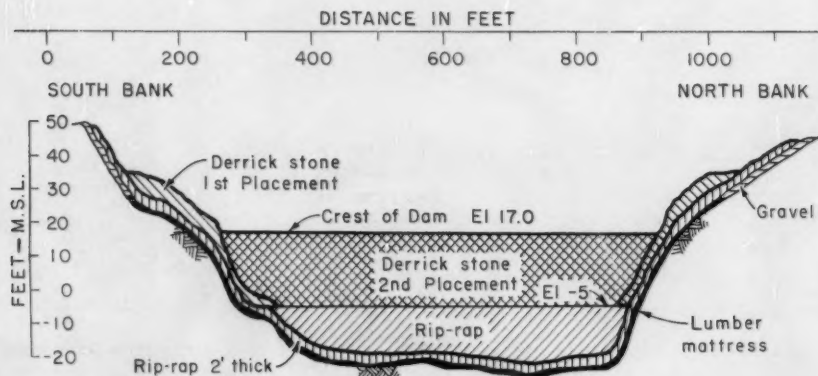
PROFILE ALONG CREST OF ROCK FILL DAM
